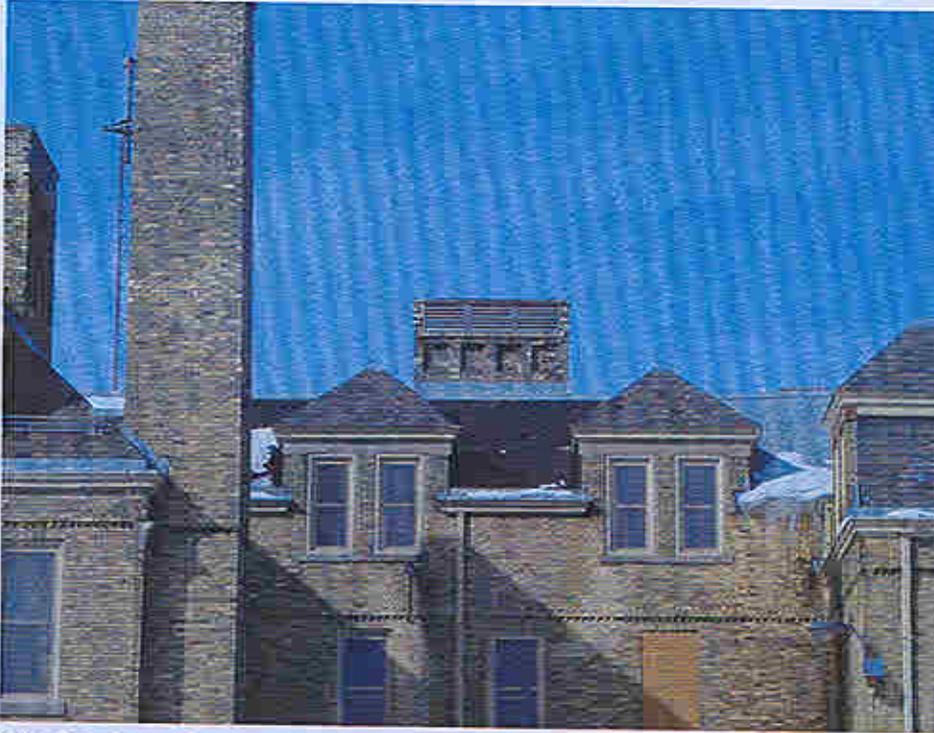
Existing slate and asphalt shingles and standing seam metal roofing would be replaced with new asphalt shingles. Wood gutters would remain with new liners installed
